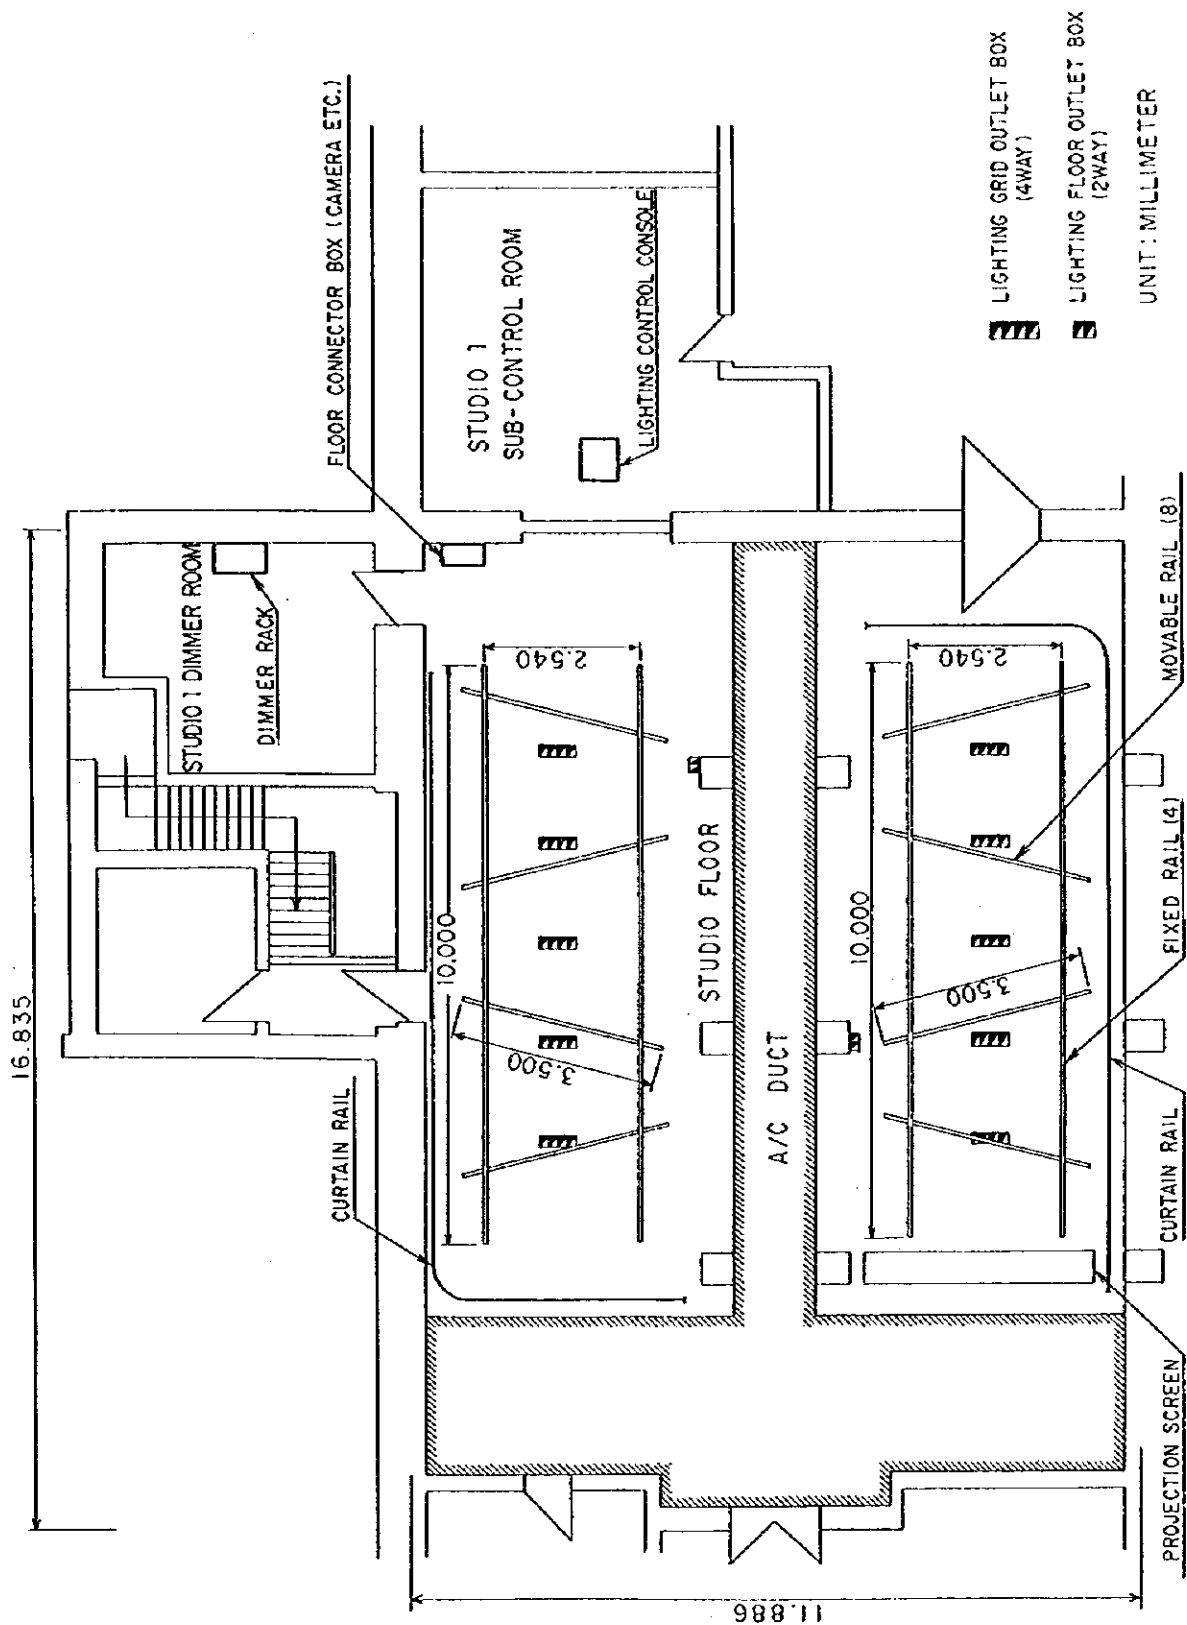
Equipment Layout of Studio 1 Studio Lighting
